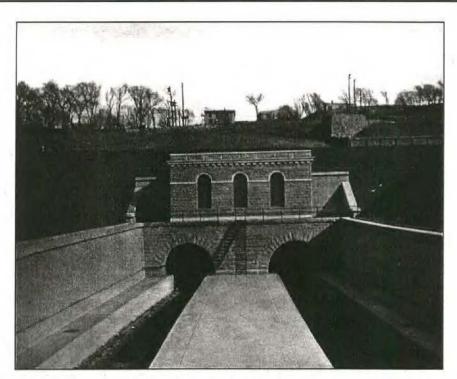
Hackensack Portals of Bergen Hill Tunnel (The New York Improvement and Tunnel Extension of the Pennsylvania Railroad p. 26.)
